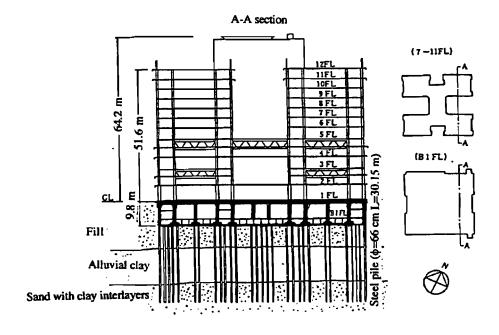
Pile foundation of the Kobe Shimin Hospital
